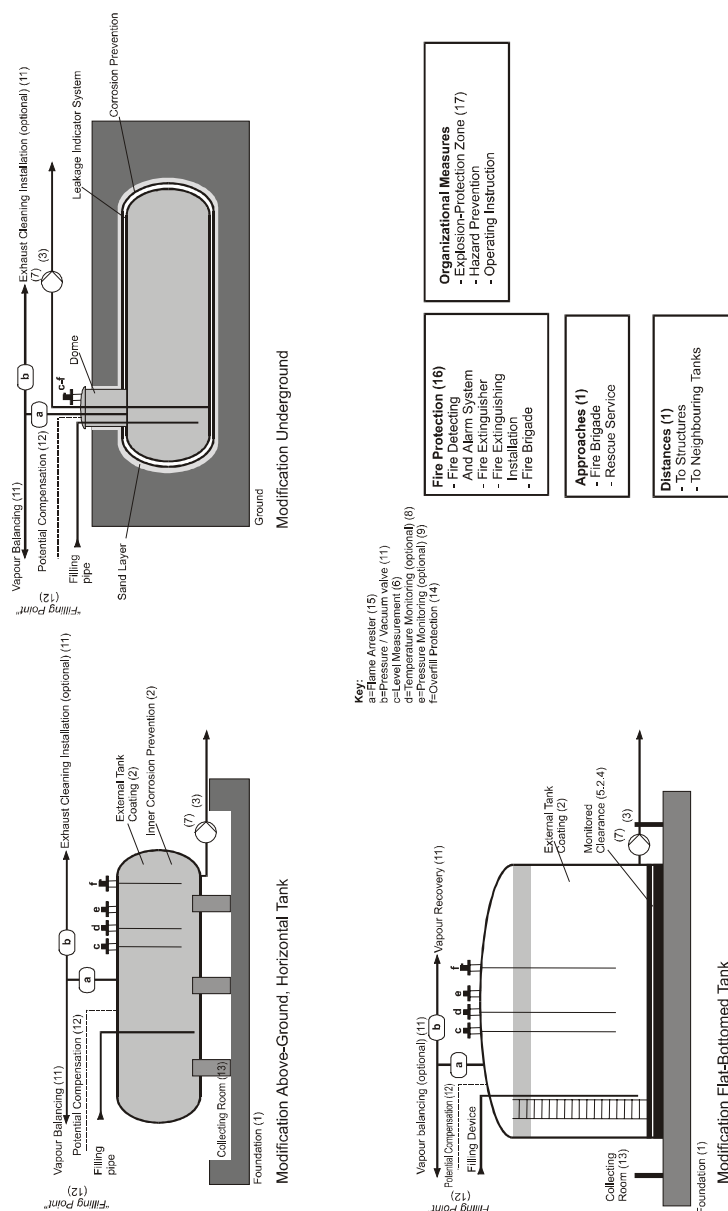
Above-ground horizontal tank an underground horizontal tank and a flat-bottomed vertical tank with equipment
